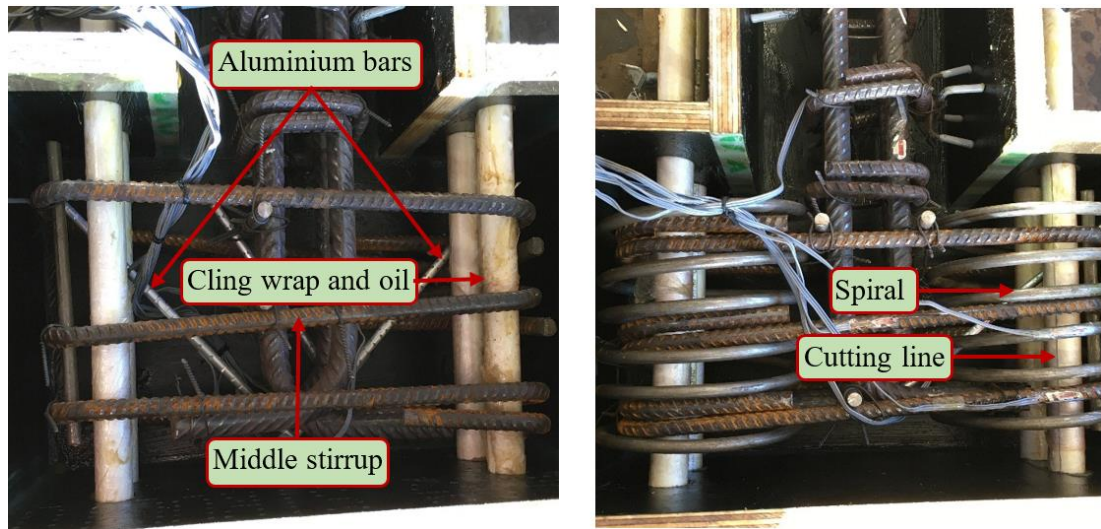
Arrangement of rebars in the concrete-end-plate.
